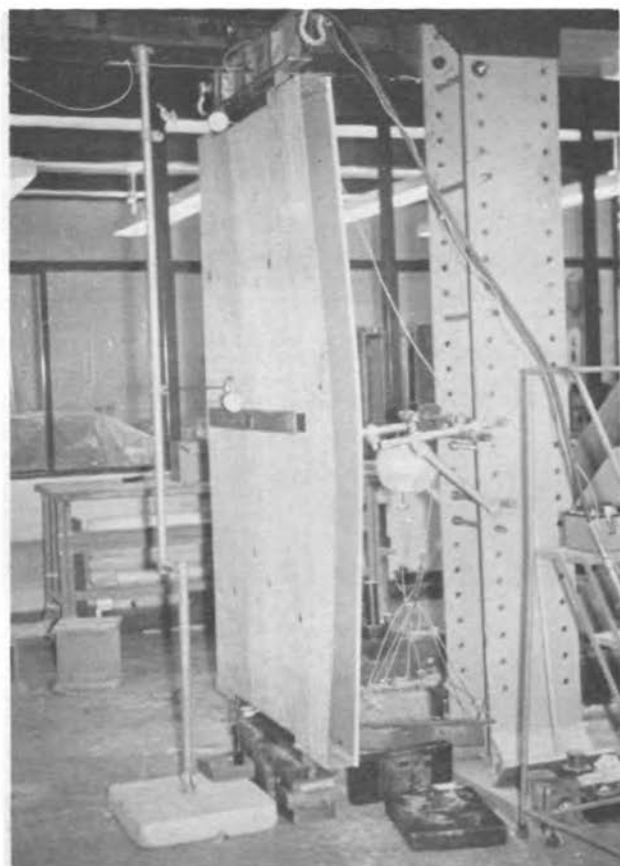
STRUCTURAL TEST ASSEMBLY FOR LOAD-BEARING
